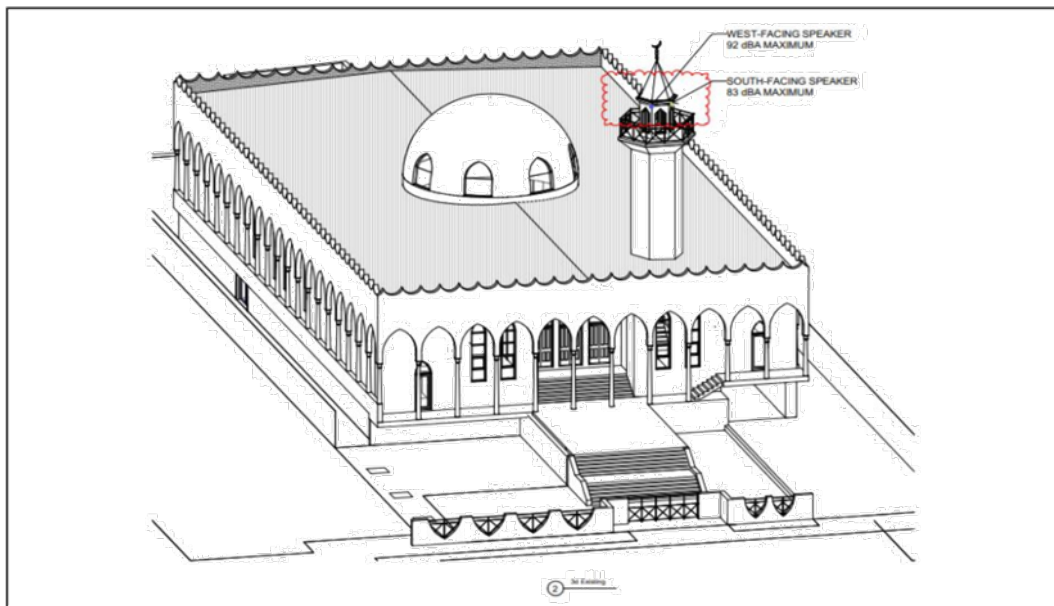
3D Model Source: Proposed Development Architectural Plans (ADS Architects)
